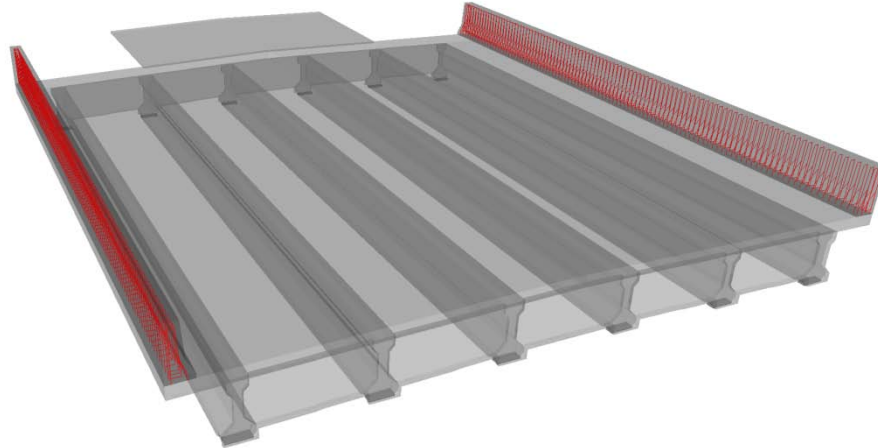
A FE model of the traffic railing barrier reinforcement
